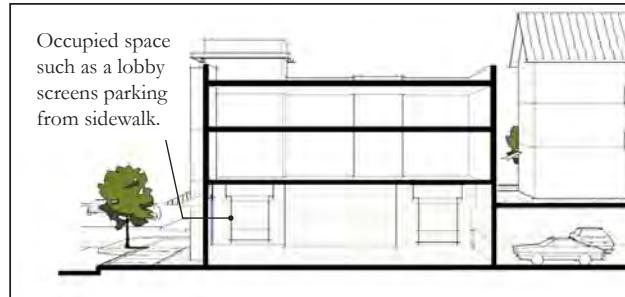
Where enclosed parking is at ground level, it should be fronted or wrapped with uses that can be occupied such as lobbies and living space when possible.
